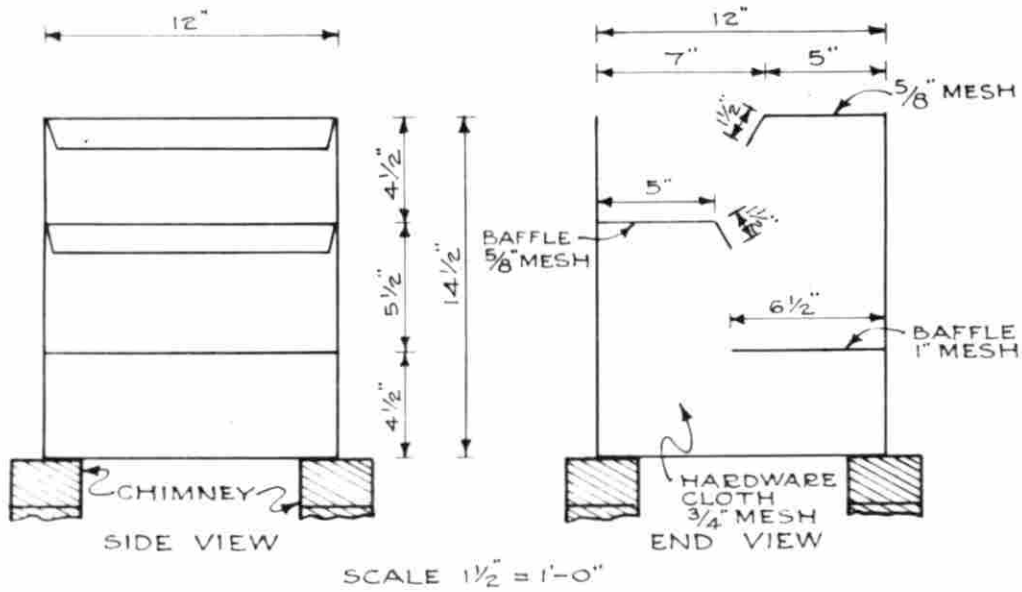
SECTIONAL SKETCH OF NO. 9 SPARK ARRESTER
